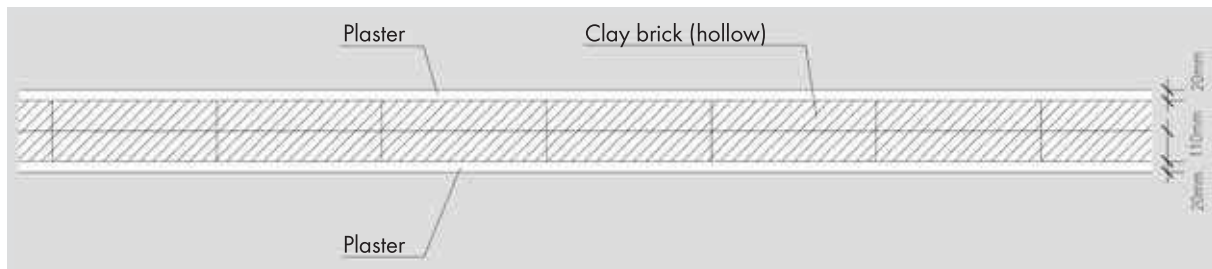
Horizontal cross-section of a conventional heavyweight masonry partition wall
